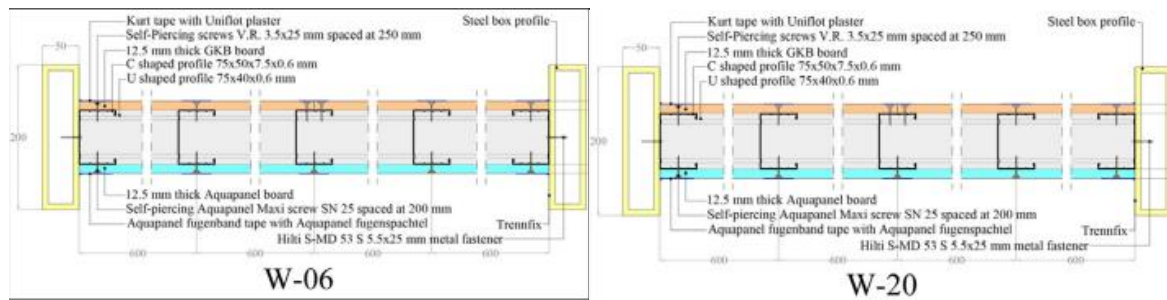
Horizontal Section of façade with sliding and fixed connection
